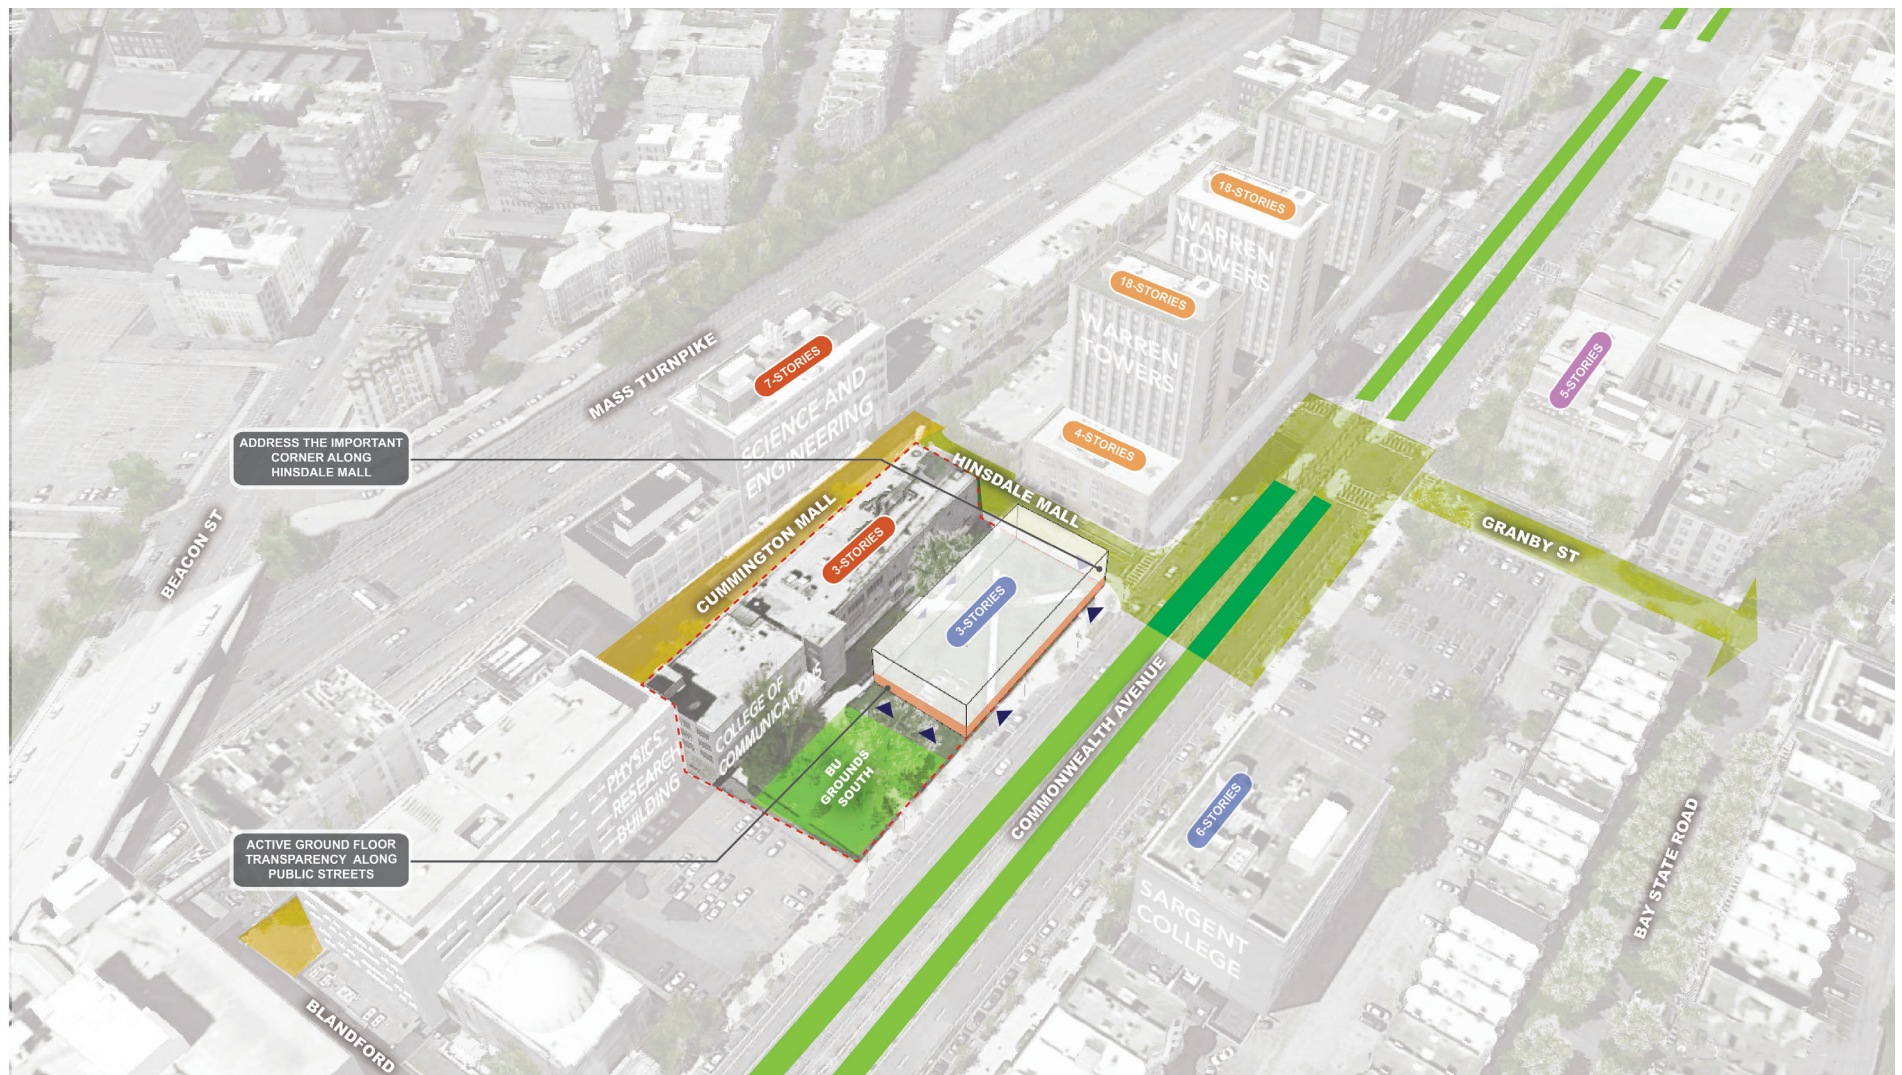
Site DD: 640 Commonwealth Avenue
